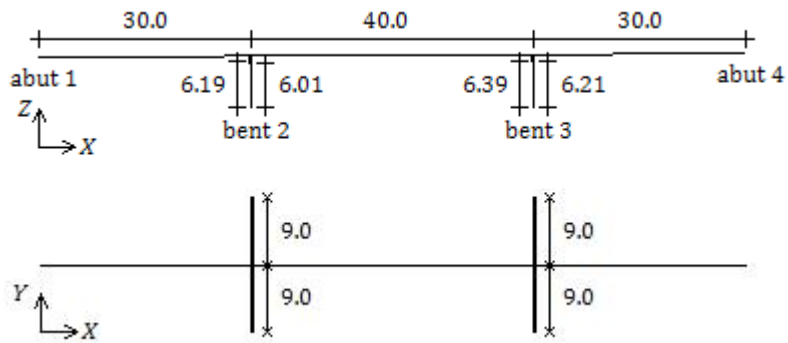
Big Rock Wash Bridge: Elevation and plan (Dimensions are in meters).
